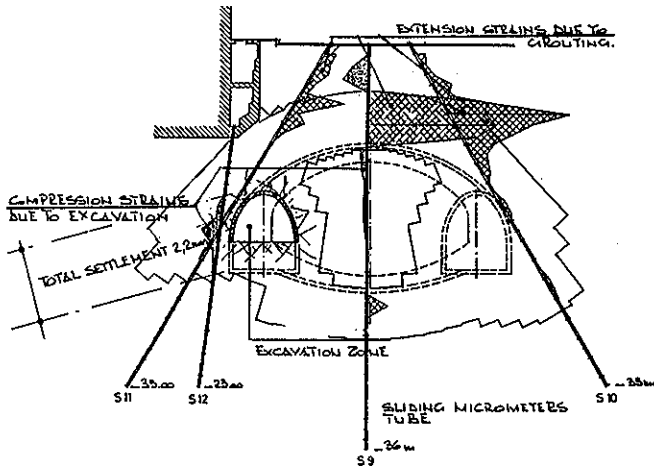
Strains recorded by she sliding micrometers during side-wall drift excavation.
